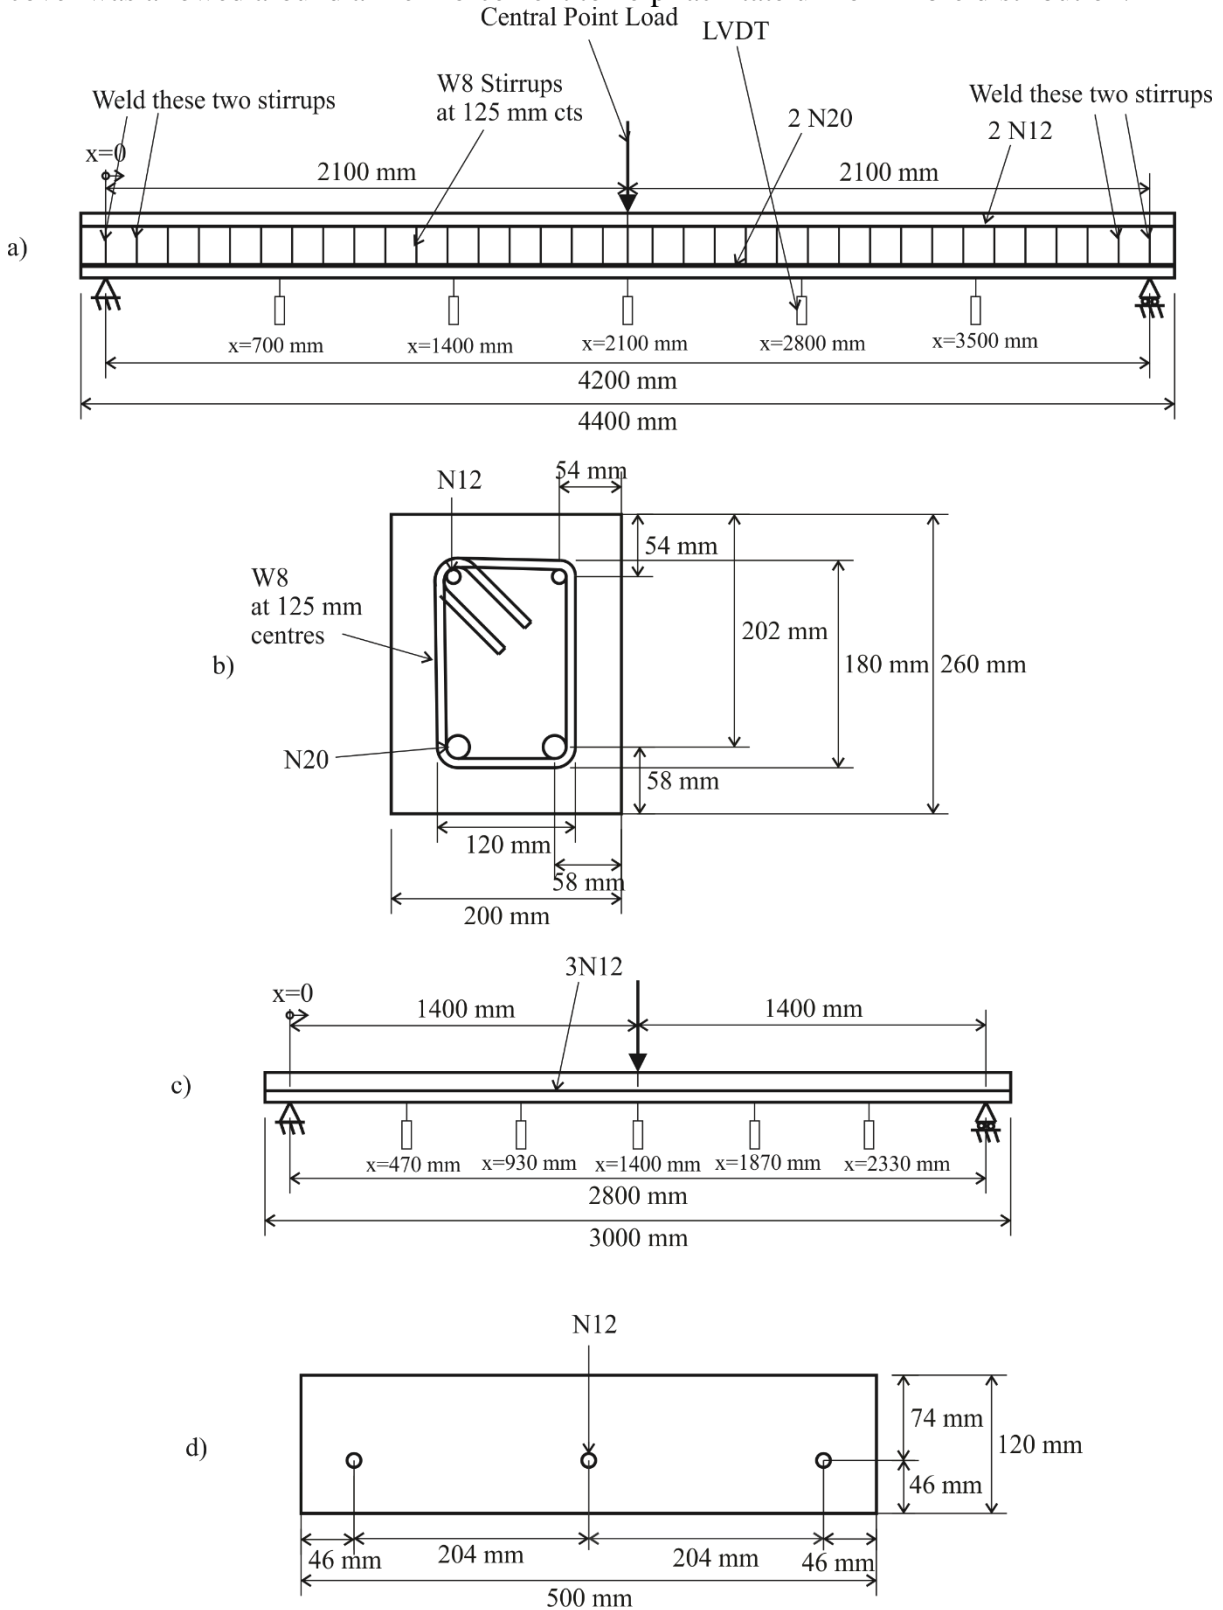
Test specimens: a) elevation of beam section; b) cross-section of beam section; c) elevation of slab section; d) cross-section of slab section
